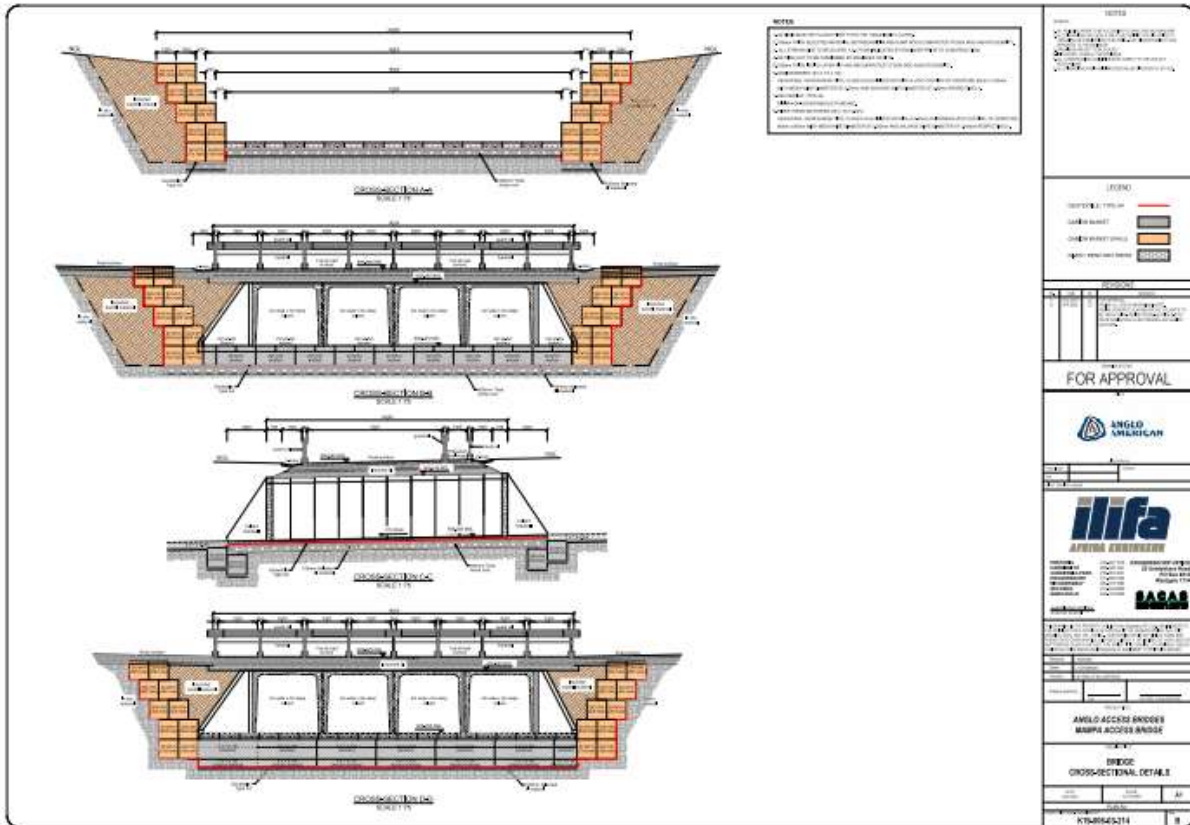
Proposed design of the upgraded Mampa low-water bridge (Ilifa, 2020)
